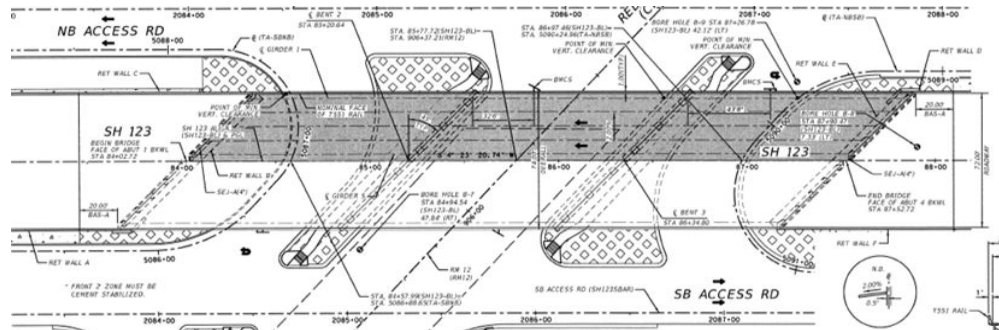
4 San Marcos SH123 Bridge Plan View Drawing (TxDOT)
